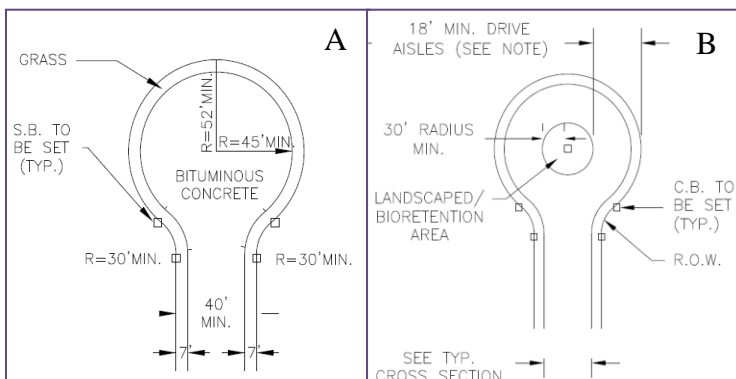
(A) Existing design details may require updating (B) to accompany revised street and parking requirements, such as in this revised cul-de-sac detail for Attleboro, MA that incorporates a reduced paved radius and a central bioretention/landscaped island.
